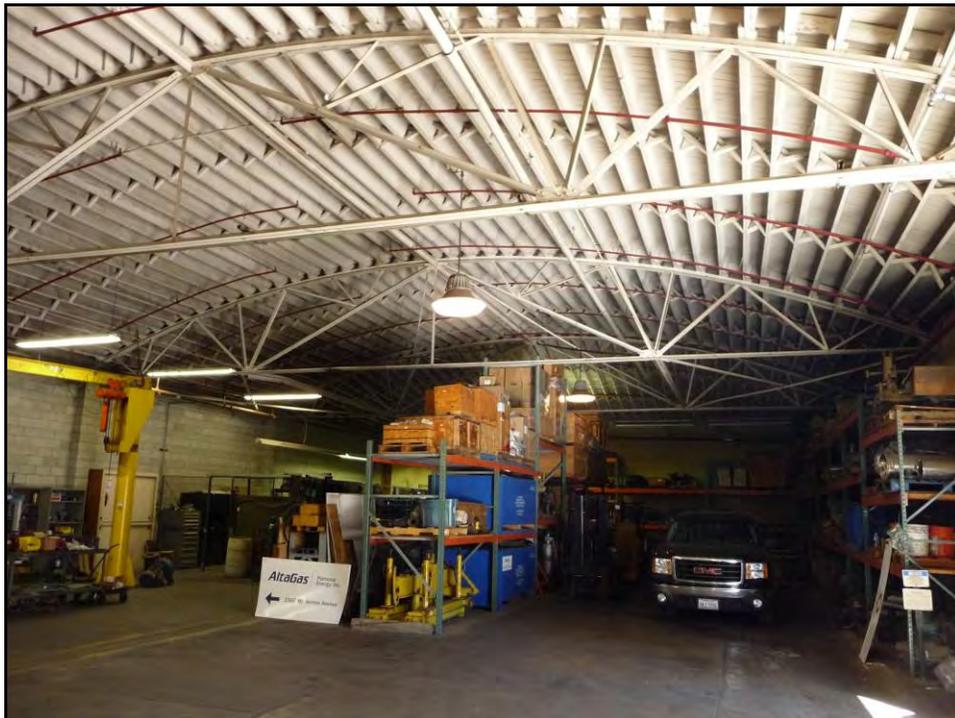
North and east sides of Building 2, camera facing southwest, November 17, 2015.
